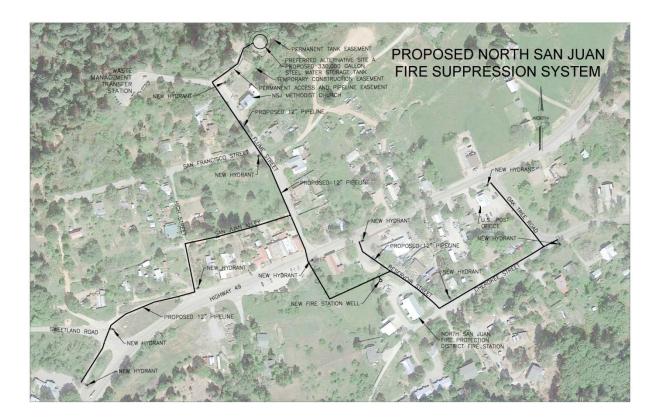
Site Plan for the North San Juan Fire Suppression Project which was revised to show the new well location in a previously-disturbed area in the fire station parking lot.
